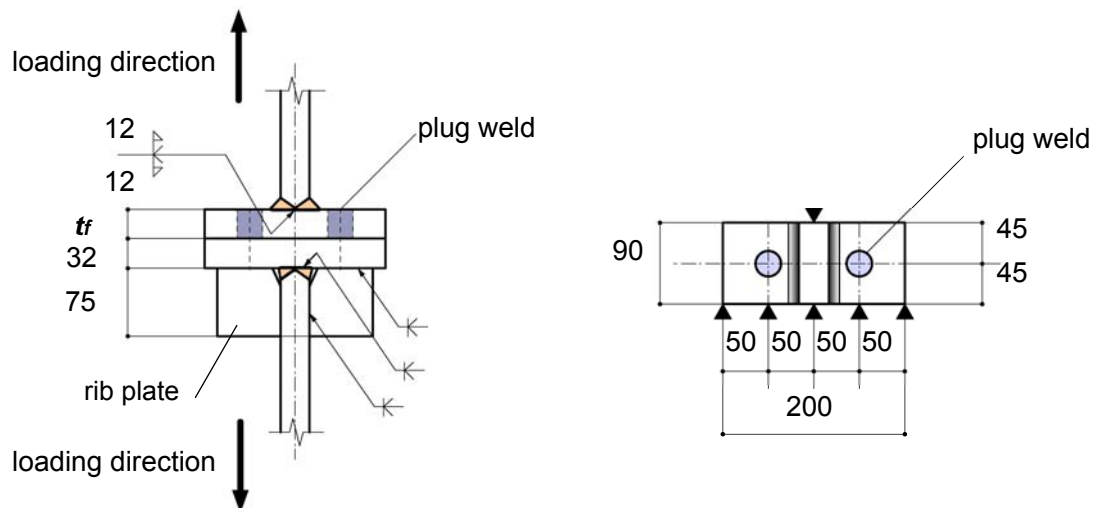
Geometrical Property of T-T Joint Specimen (unit : mm)
